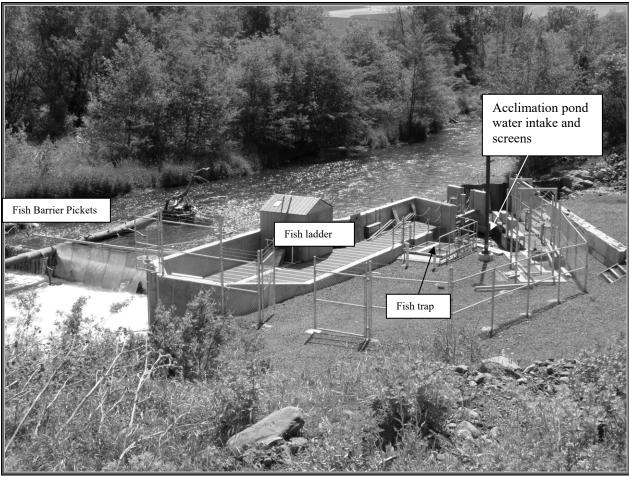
View of Dayton Adult Trapping and Water Diversion Facility, Touchet River.
